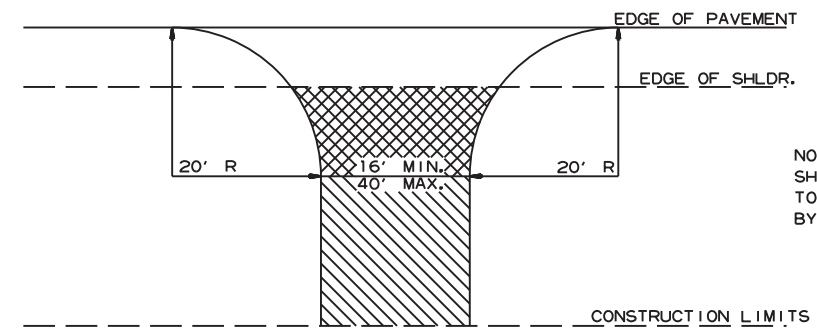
DETAIL FOR COUNTY ROAD TURNOUTS OPEN SHOULDER SECTION
